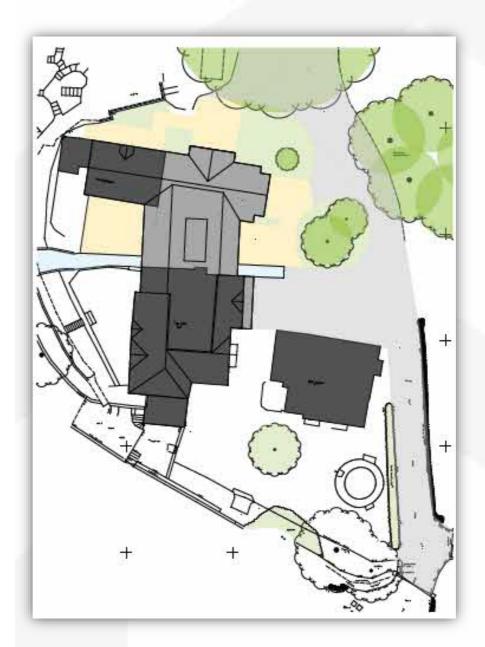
Proposed Site Plan, Drawing No. 22.425 S02.05 (Swain Architecture).
